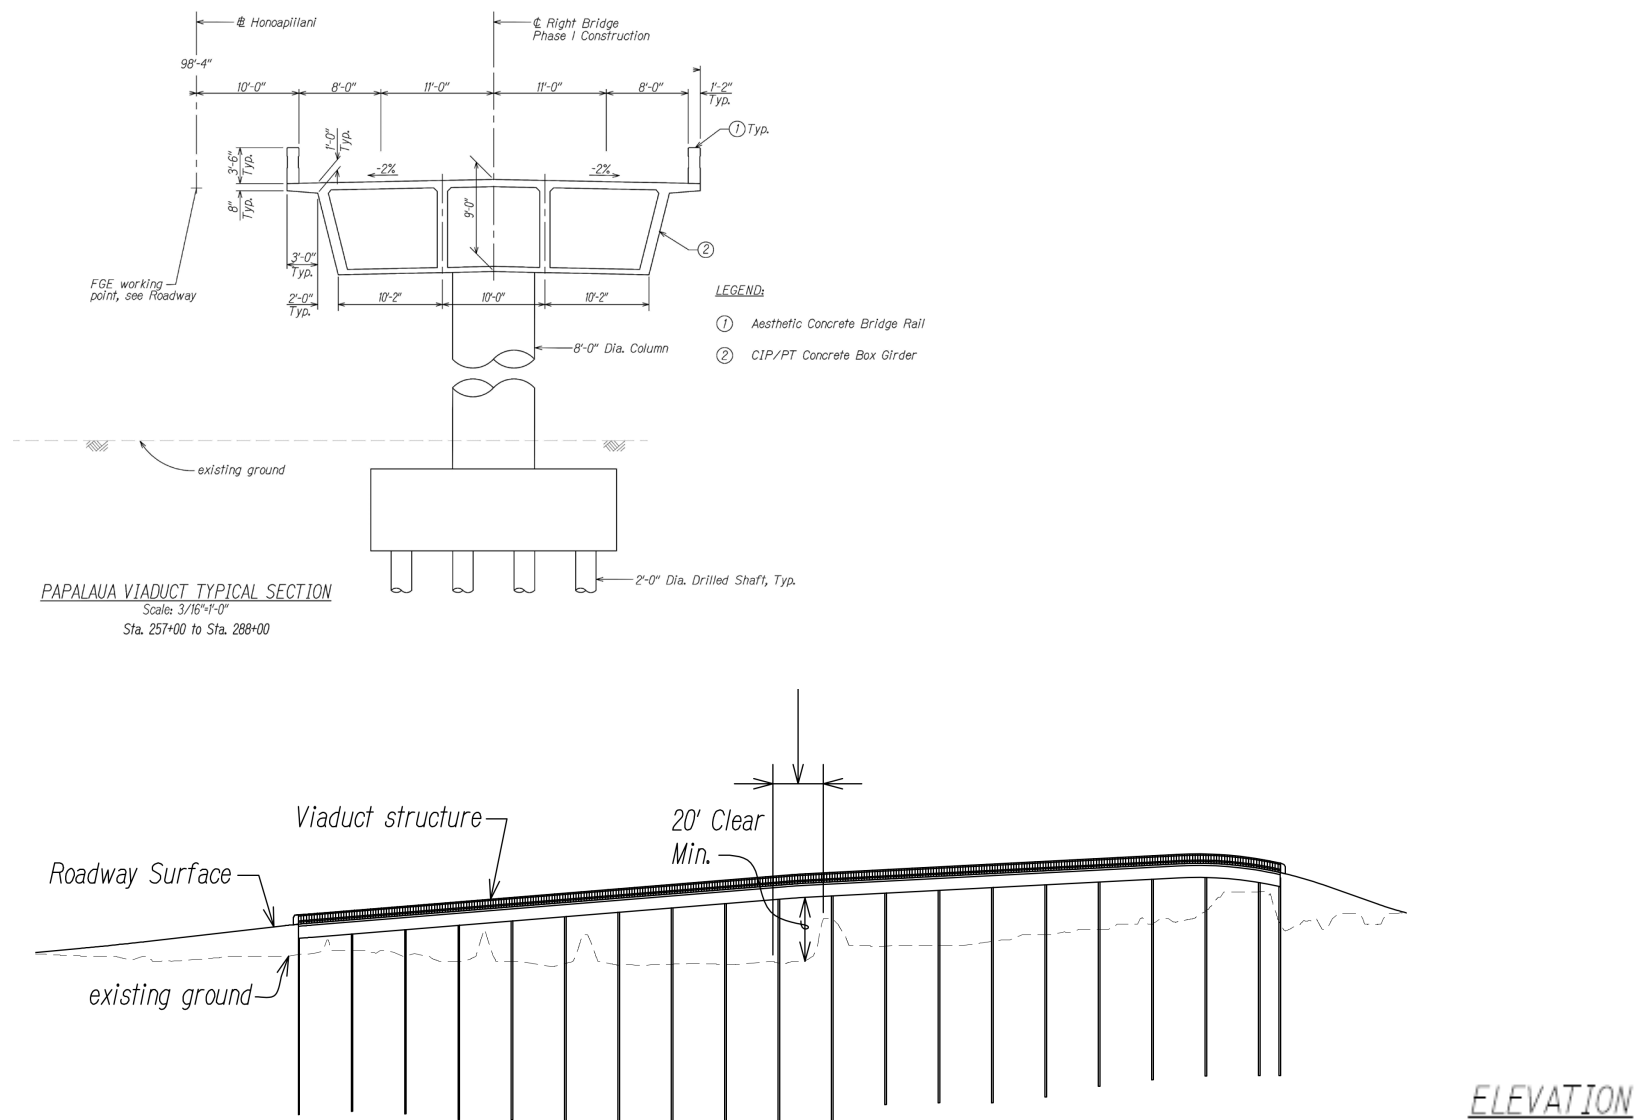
Typical Short Span Bridge Elevation and Section
